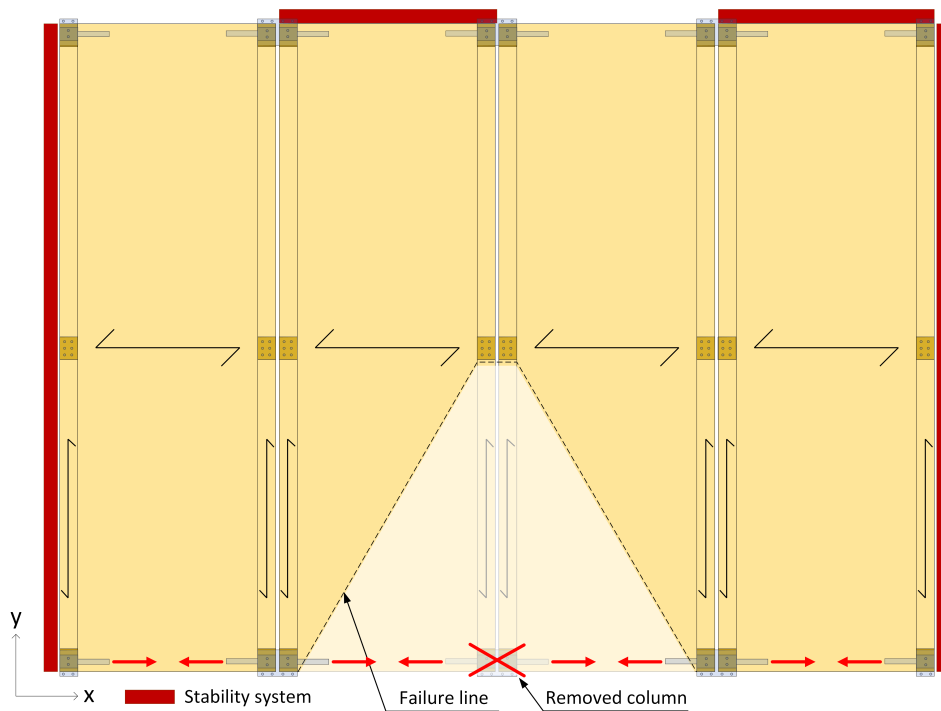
Top view of the floor system of the modular building section. The assumed failure line for the CLT panels and GLT beams fail, when the middle facade column is removed, is indicated. Together with the force component in x-direction in the connections forming the catenary.
